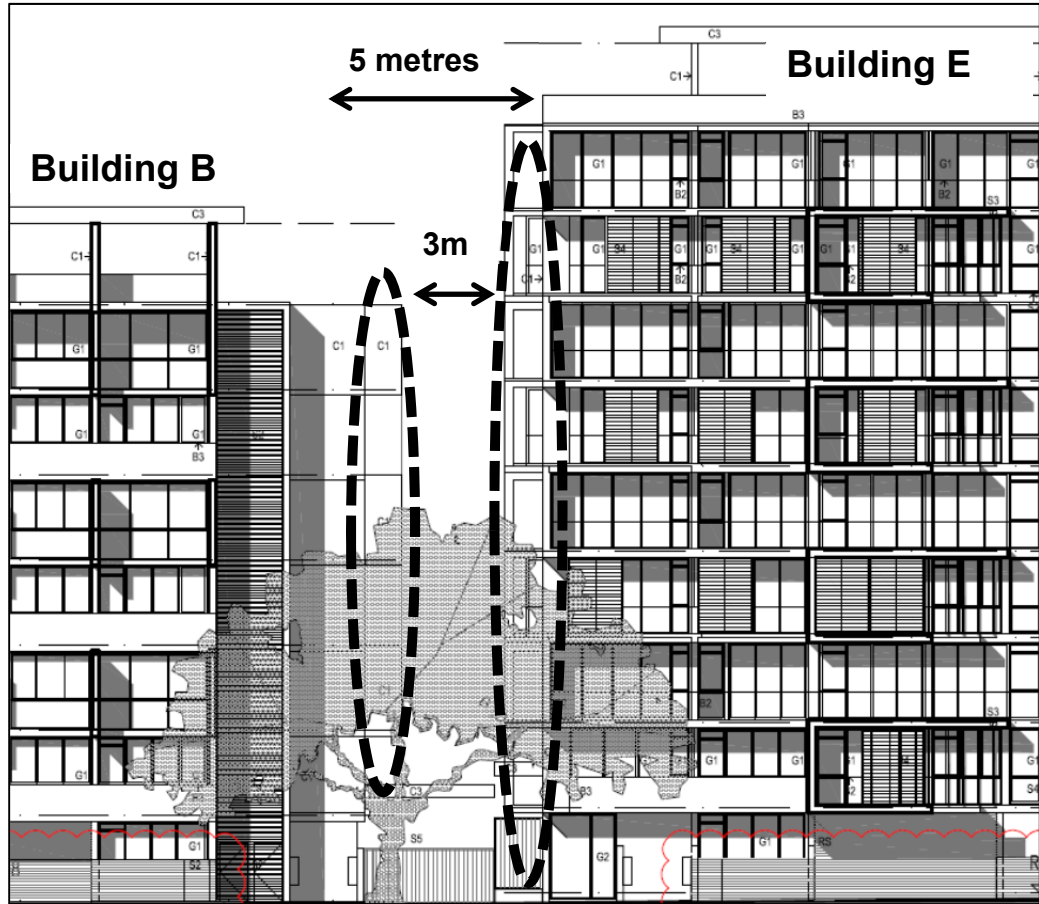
Location of the proposed window projections and reduced separation between Buildings B and E
